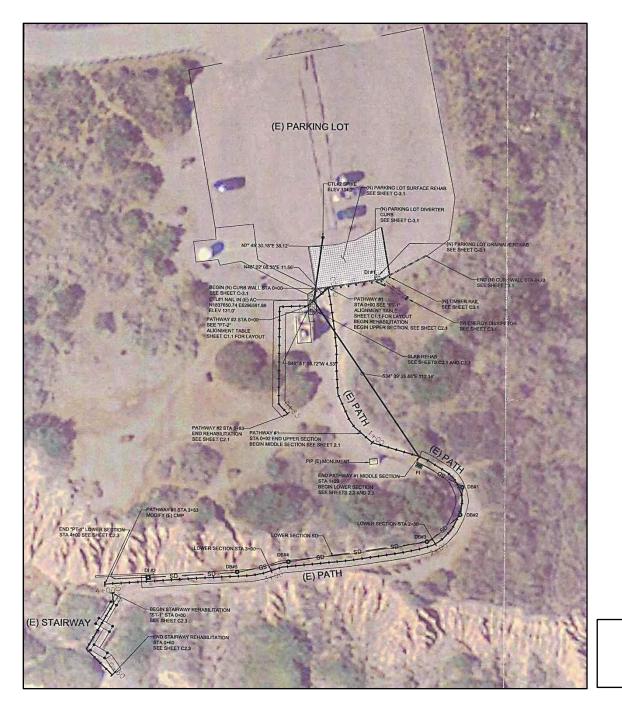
Project Site Plan MSB-NOID-0005-14
